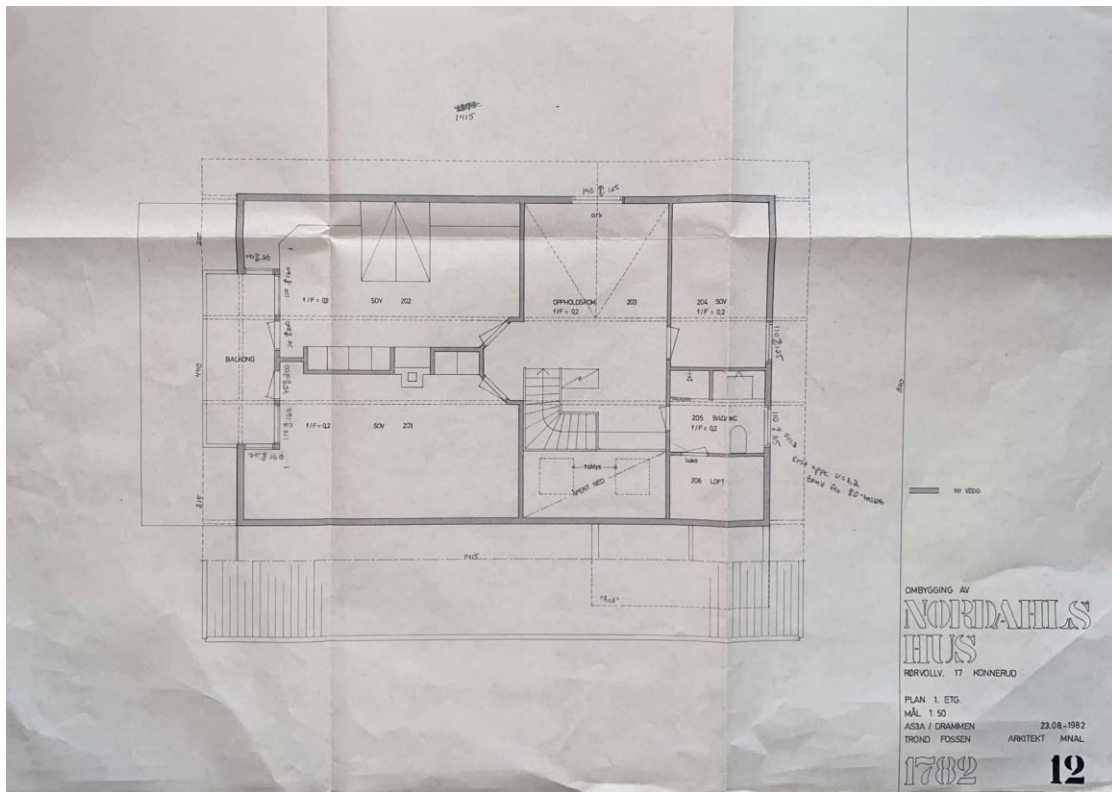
Floor Plan of the second floor in Rørvollveien 17.
